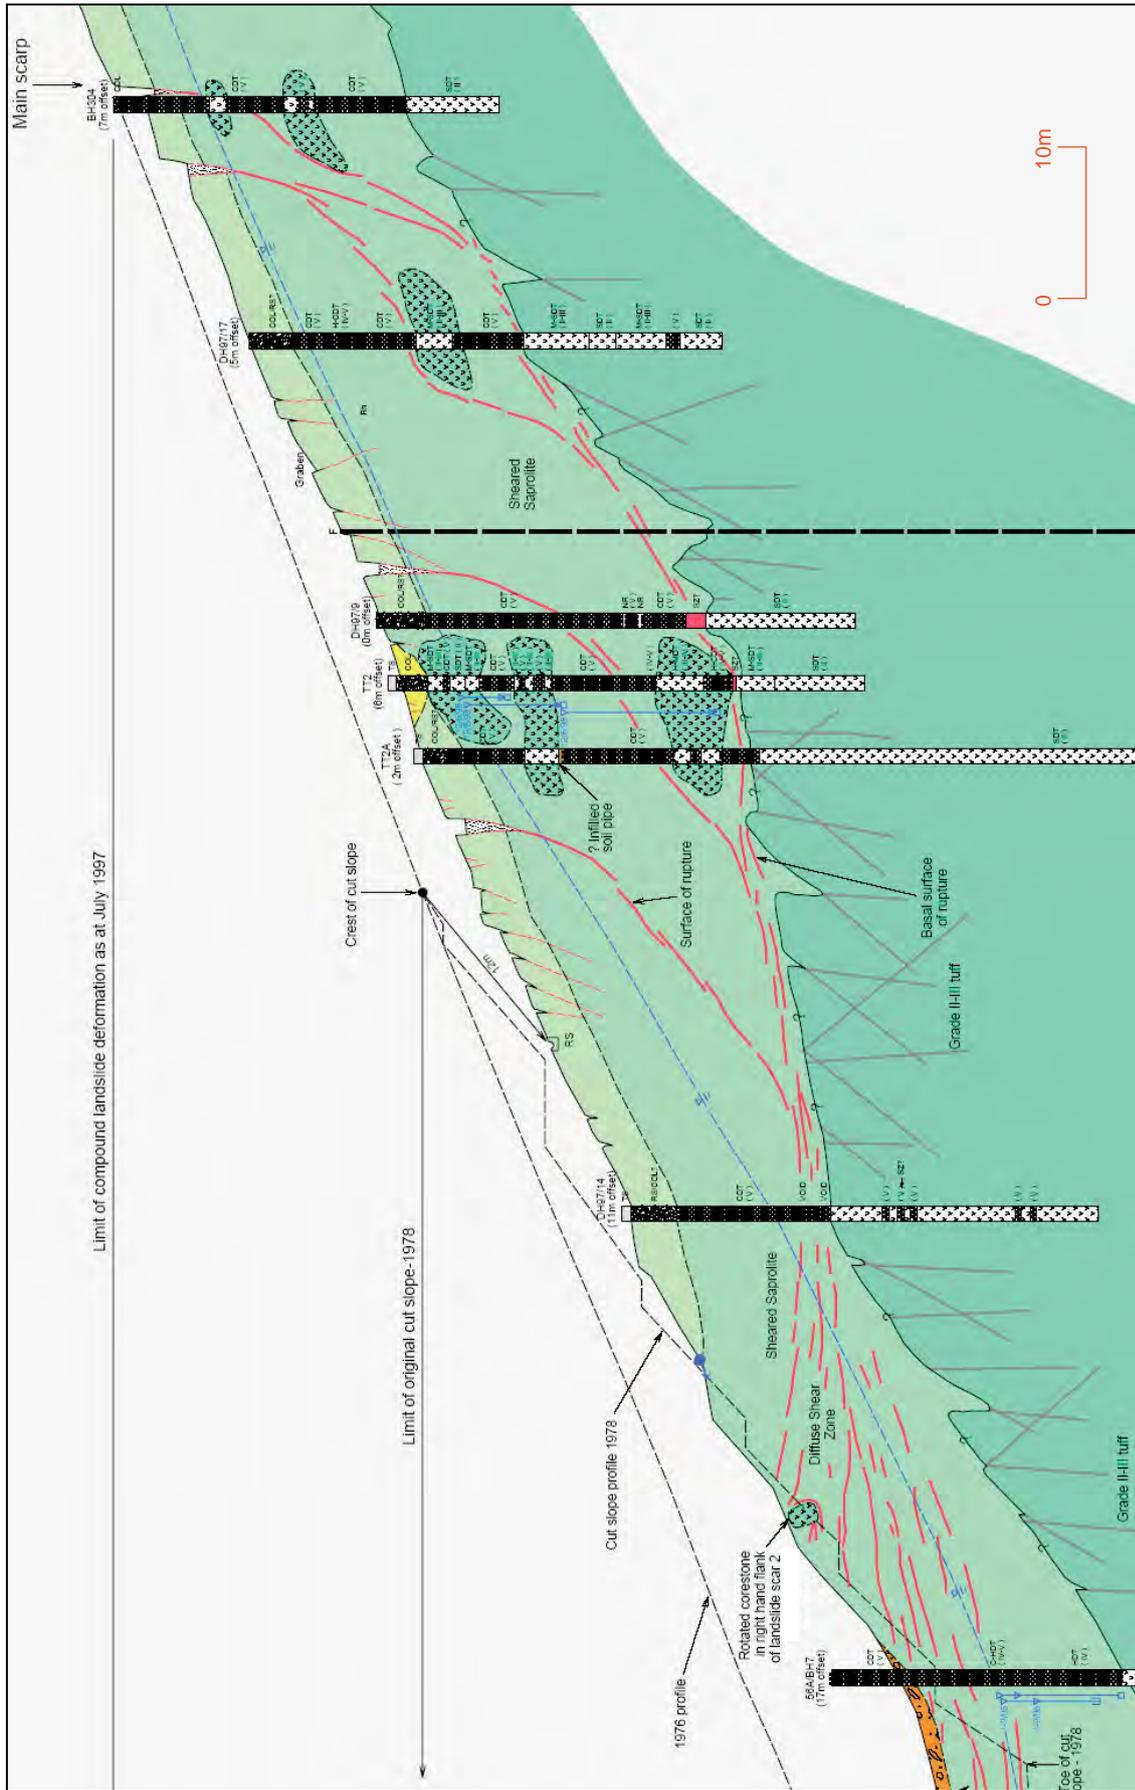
Extract of section through the Lai Ping Road landslide showing deep weathering, high groundwater and shear planes associated with deep-seated movements (Koor & Campbell, 2005)
